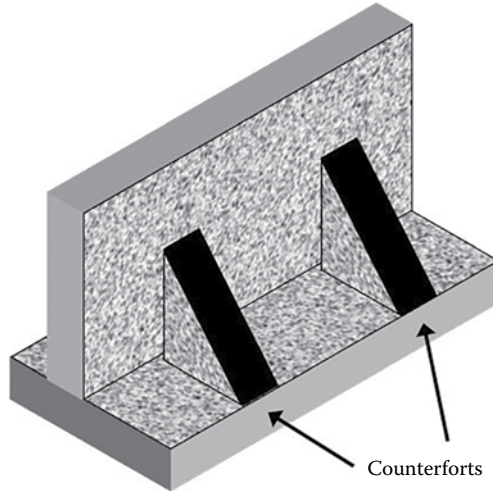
A simplified counterfort retaining wall. (Credit: A. Braham.)
